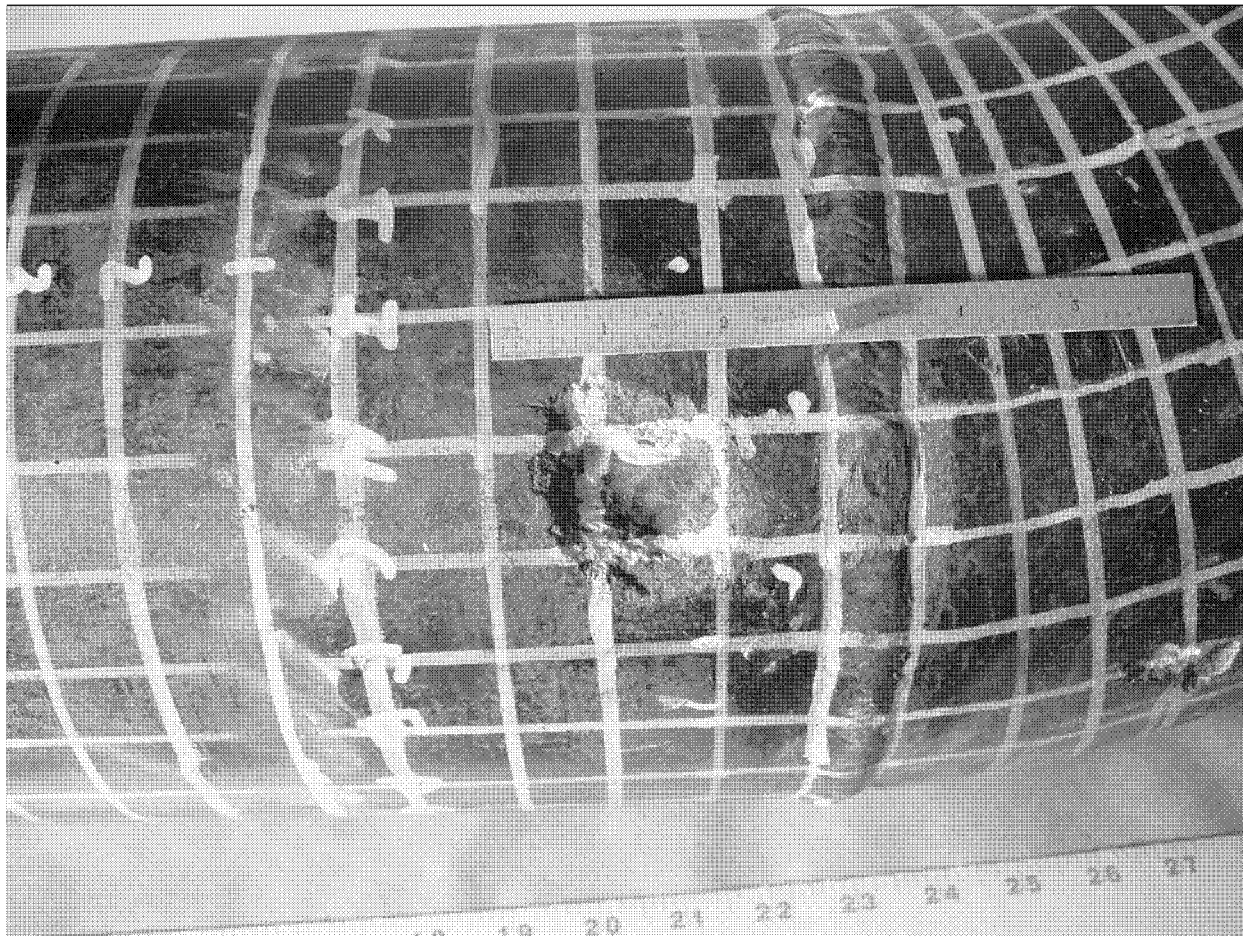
Detail of corrosion on girth weld in the location designated Area 5.
